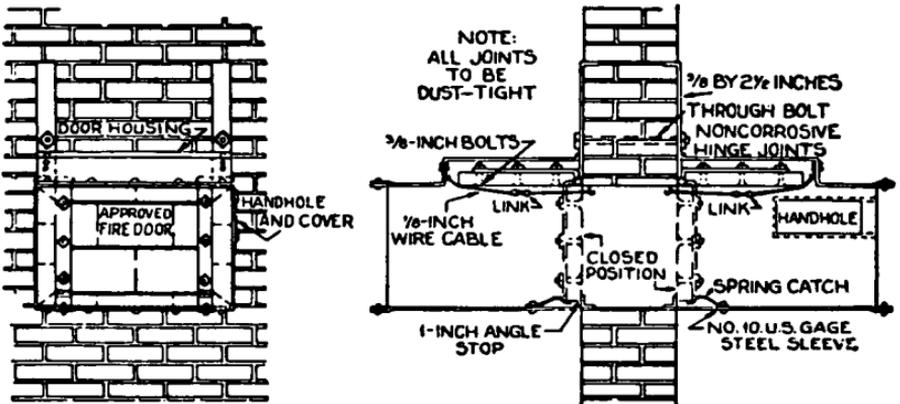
Suggested type of automatic hinged fire door for duct passing through opening in fire wall
